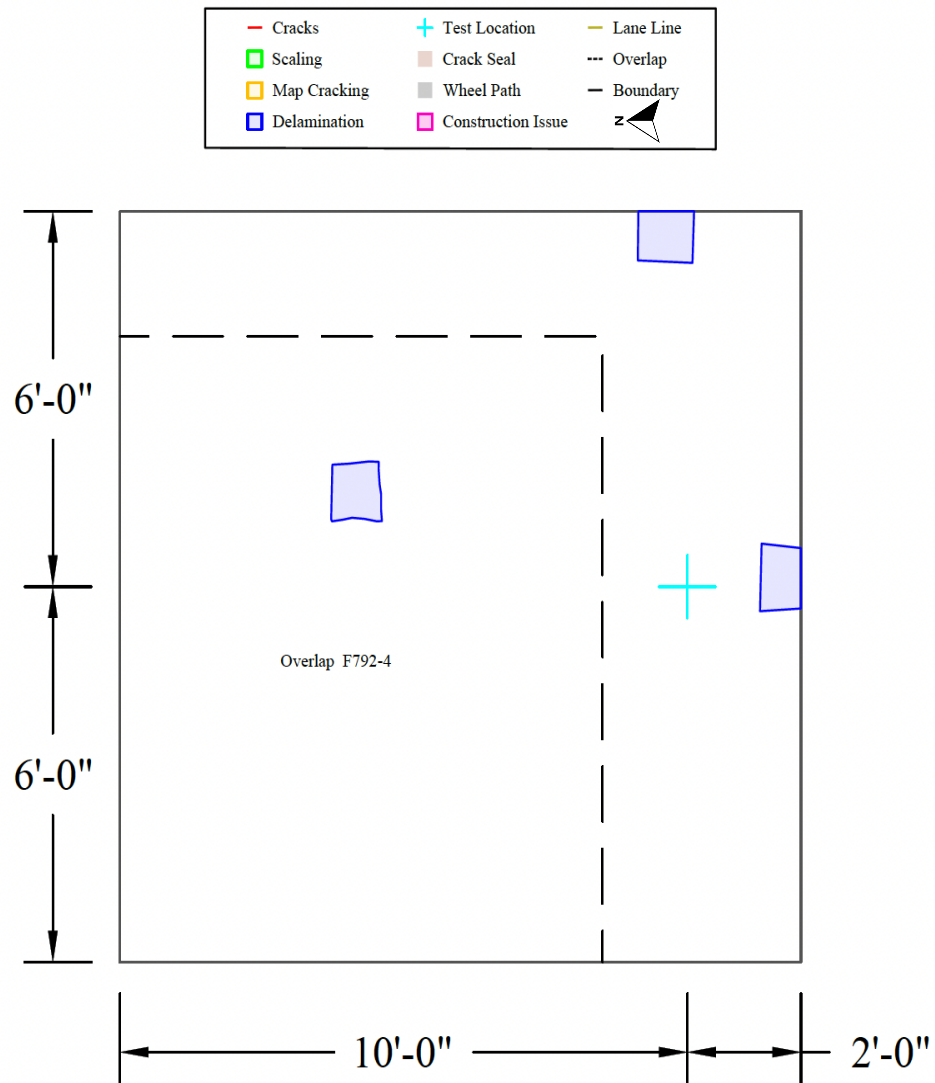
Test location 5 of lightweight concrete deck at bridge F-792.
